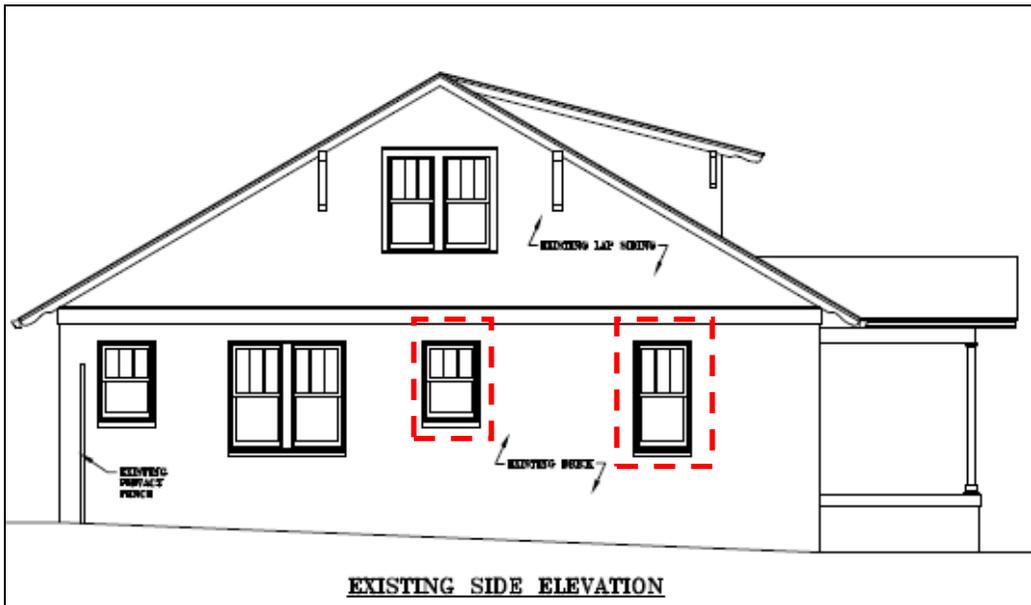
shows the existing windows that are to be removed on the left side elevation.
